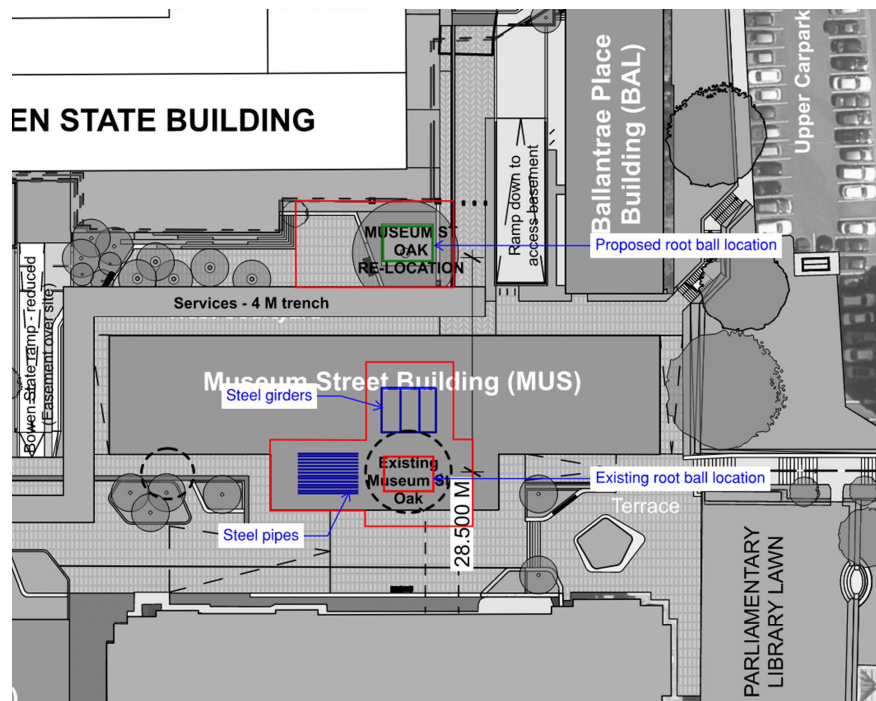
Plan of site showing existing and proposed tree location and working area to install the structural lifting frame.
